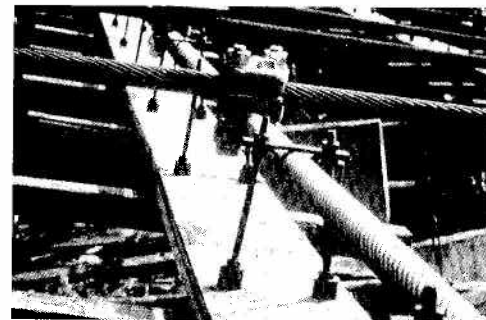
Detail of shutter attachment by clamp and threaded rod for lattice beam formwork
